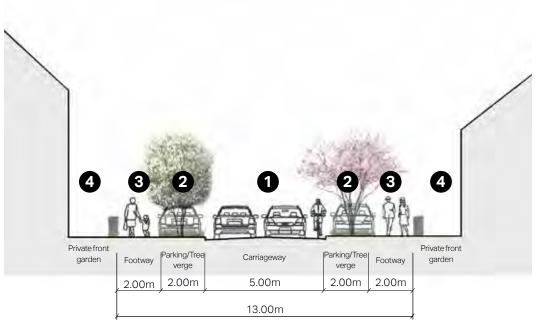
Section showing indicative dimensions for secondary roads. In some places tree verges may be omitted from one or both sides, and parking bays may alternate with tree verges.
